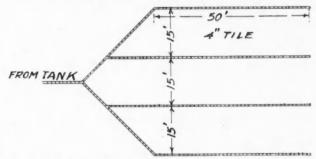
Drainage Plan for Distribution of Discharge from Septic Tank.
